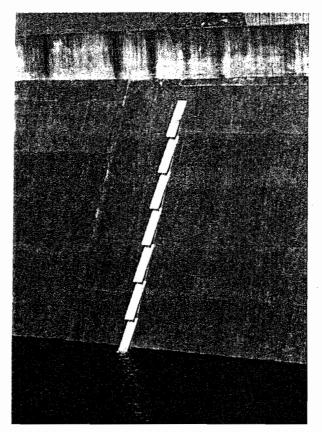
Existing Wivenhoe Dam Gauge Boards
